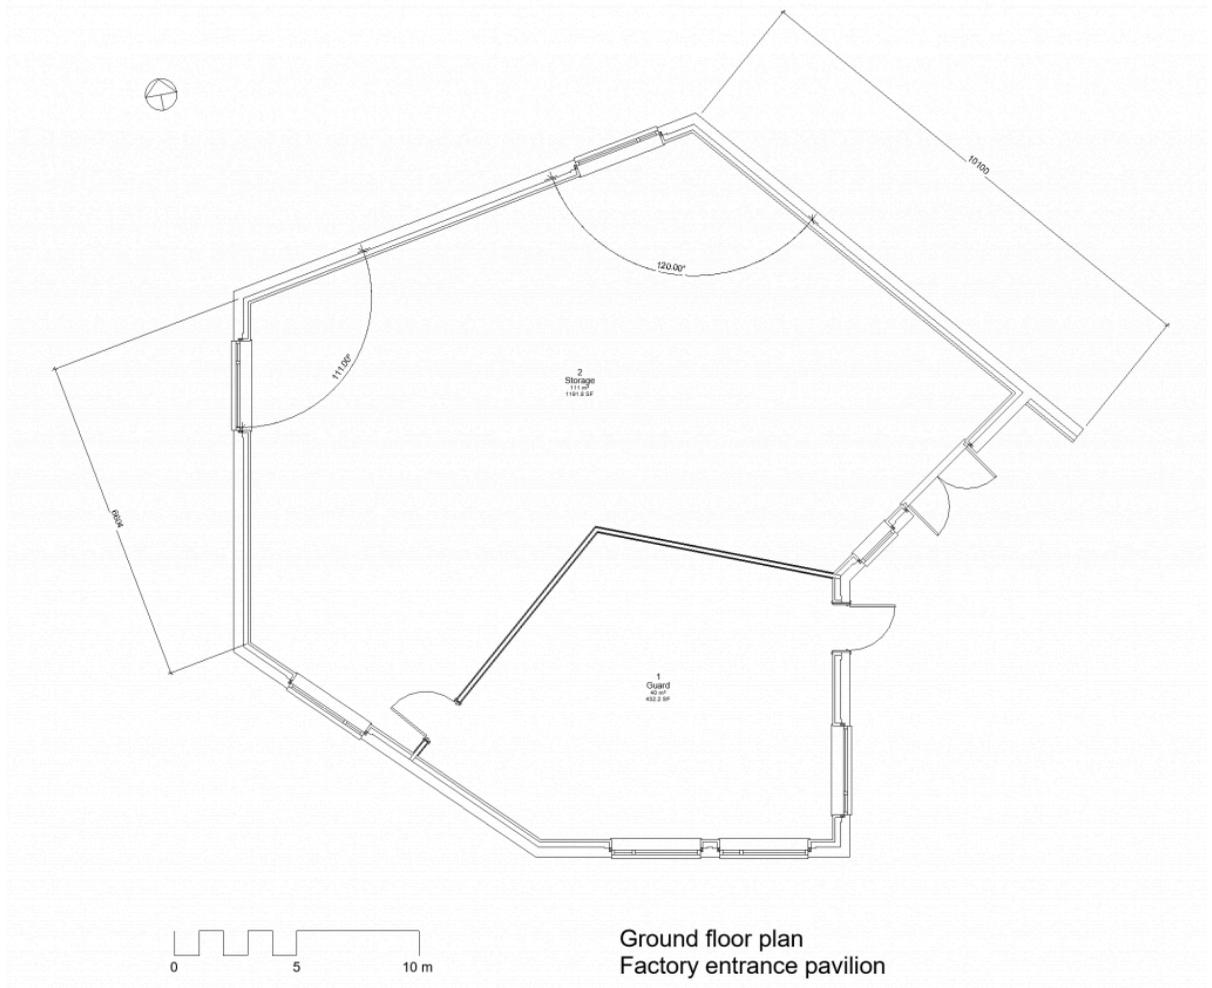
In an analogue floor plan, lines denoting building elements are primary data
